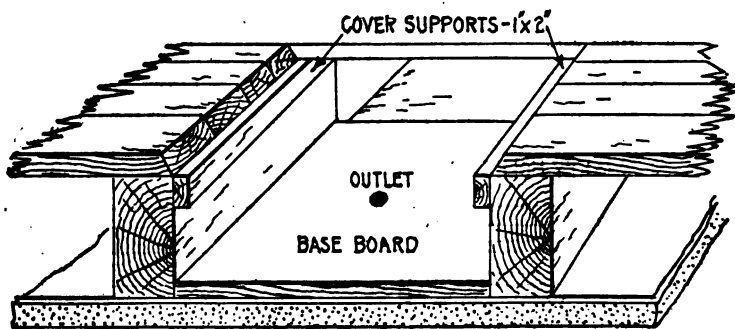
,243.—View of outlet pocket showing base board, and cover supports in position.
